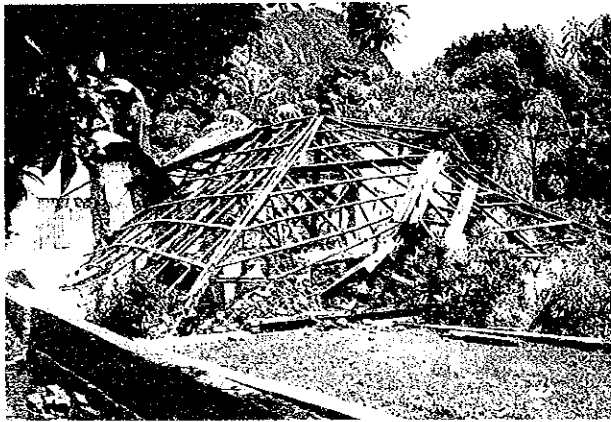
Collapse of Masonry House, Only Timber Roofing Frame Was Observed
